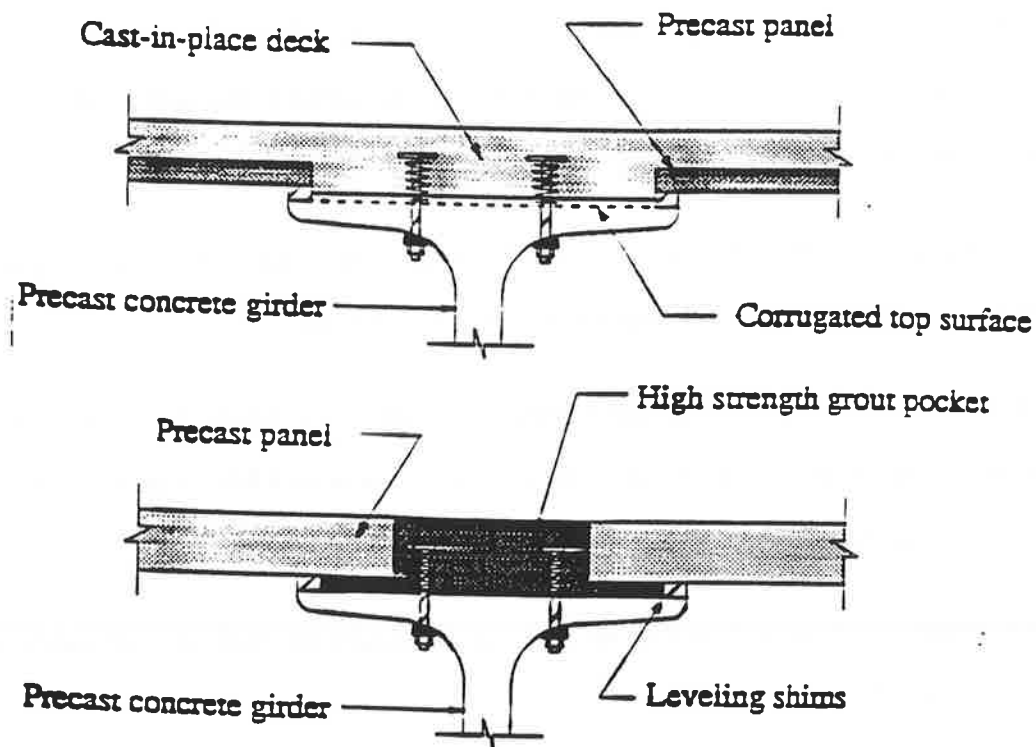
Suggested Details in survey for Concrete Girder-Deck Joint for the New Deck Design Suggestion for Improvements
